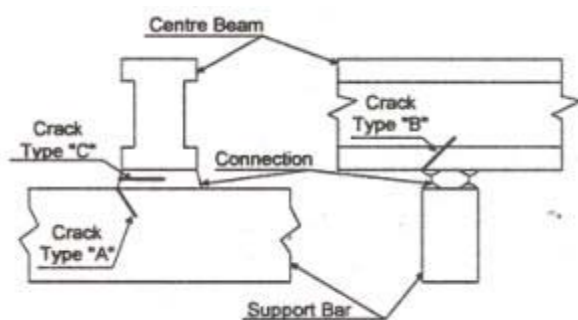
Established Fatigue Crack Patterns – Multiple Support Bar Designs
